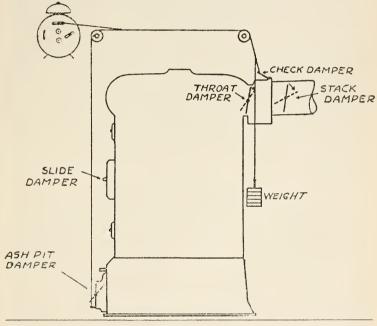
Fig. I. Schematic arrangement of furnace dampers and of alarm clock for opening drafts.
